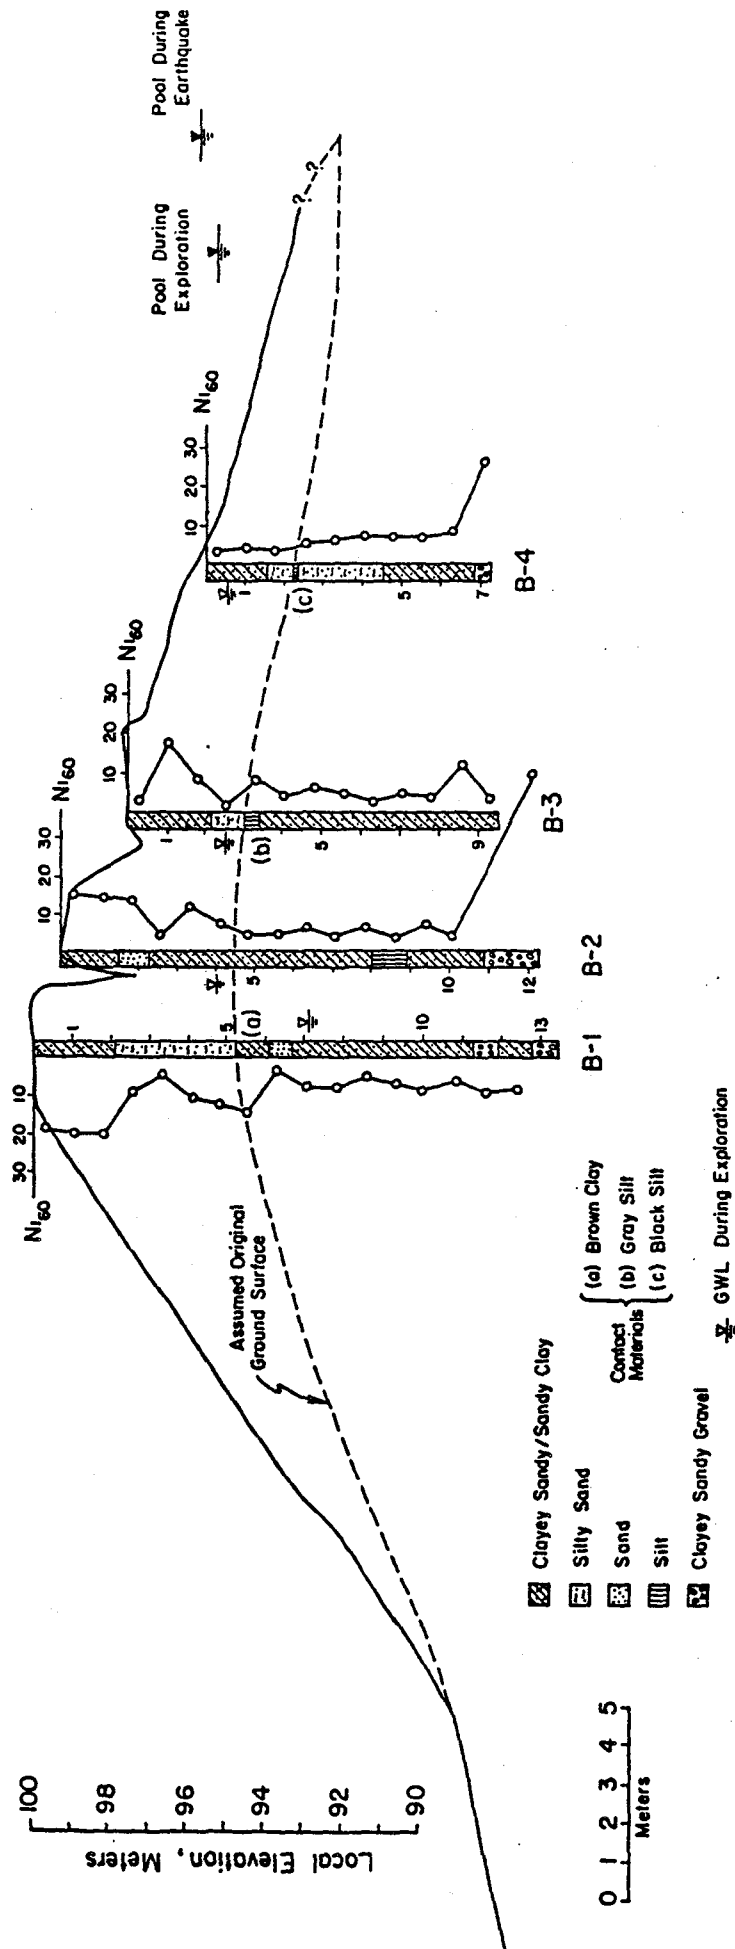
CROSS-SECTION THROUGH FAILURE ZONE OF LA PALMA EMBANKMENT
